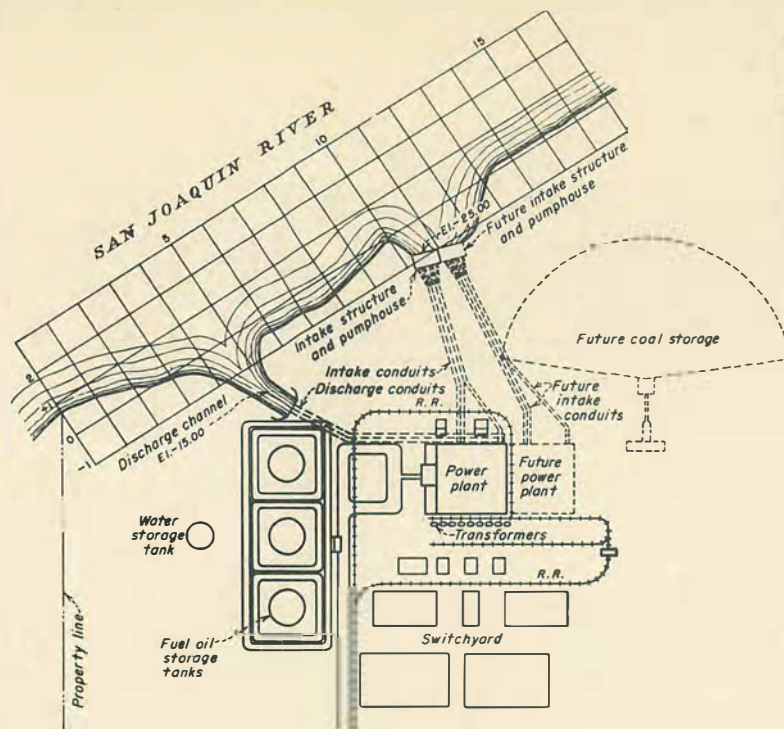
PLAN OF ANTIOCH STEAM PLANT
